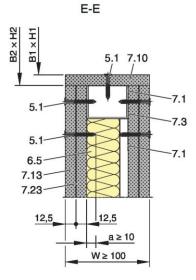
Compartment wall with metal support structure and cladding on both sides
